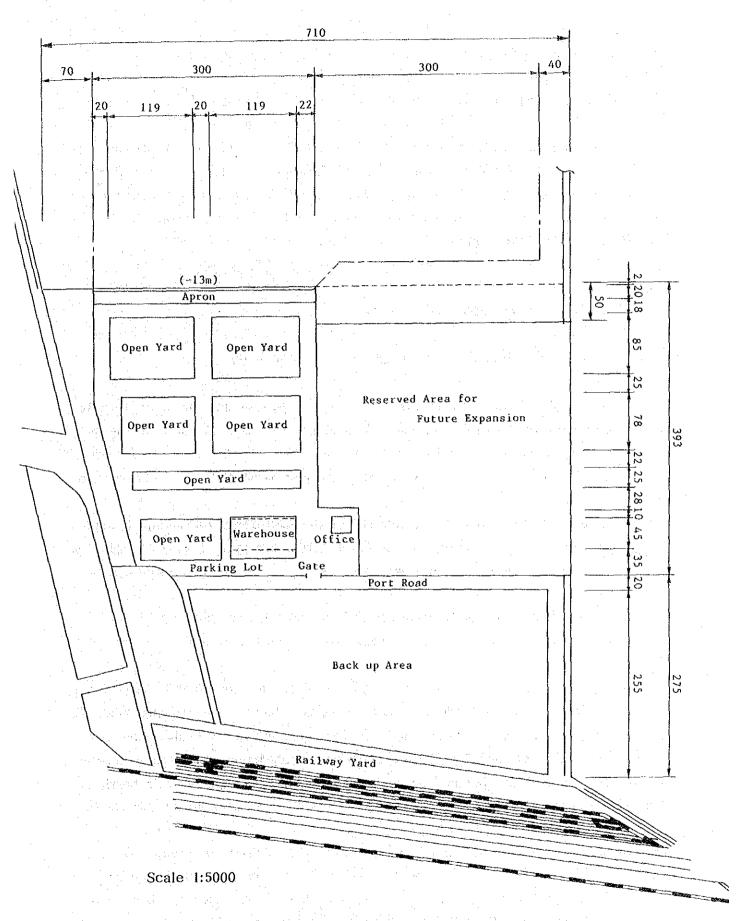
Layout Plan of the Main Facilities of Terminal-2
